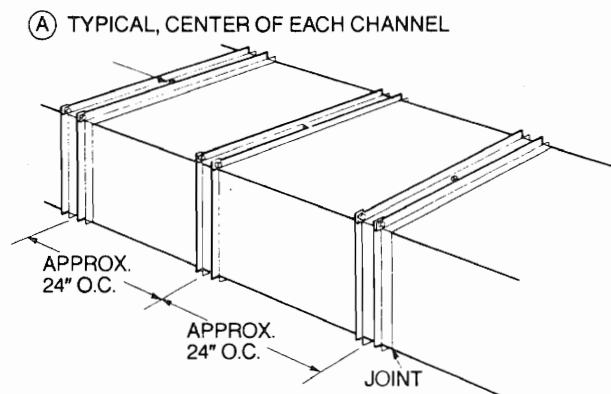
TYPICAL CHANNEL REINFORCEMENT ON 24" CENTERS, 48" DUCT SECTIONS AND 48" OR MORE WIDTH
